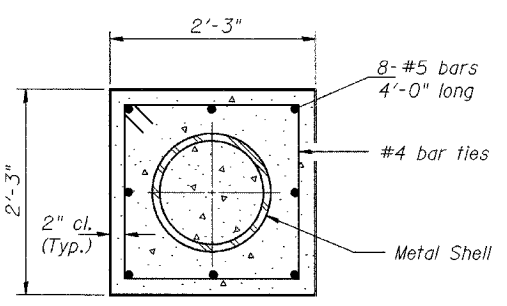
DETAIL OF REINFORCEMENT FOR METAL SHELLS AT ABUTMENTS
